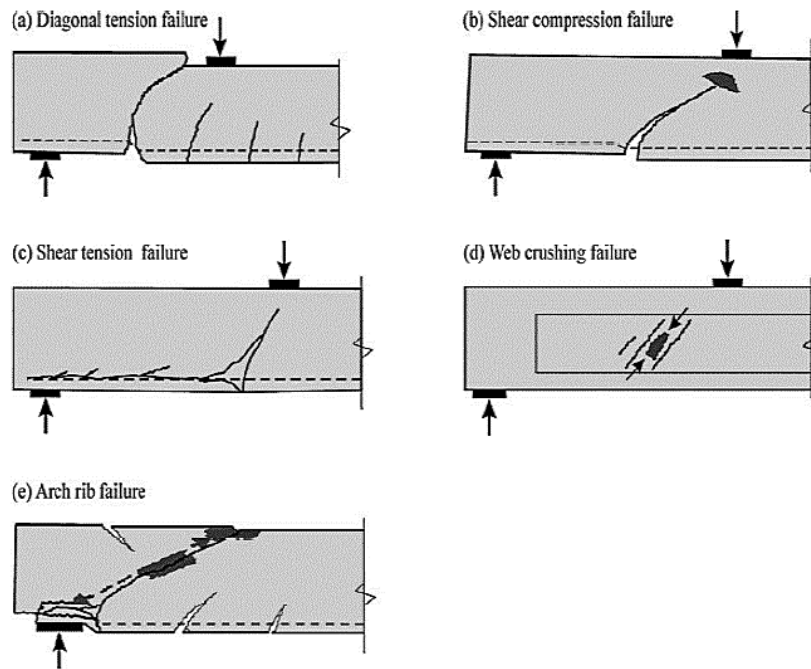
4 - Modes of shear failure of concrete beams (Pillai et. al. 2003)
